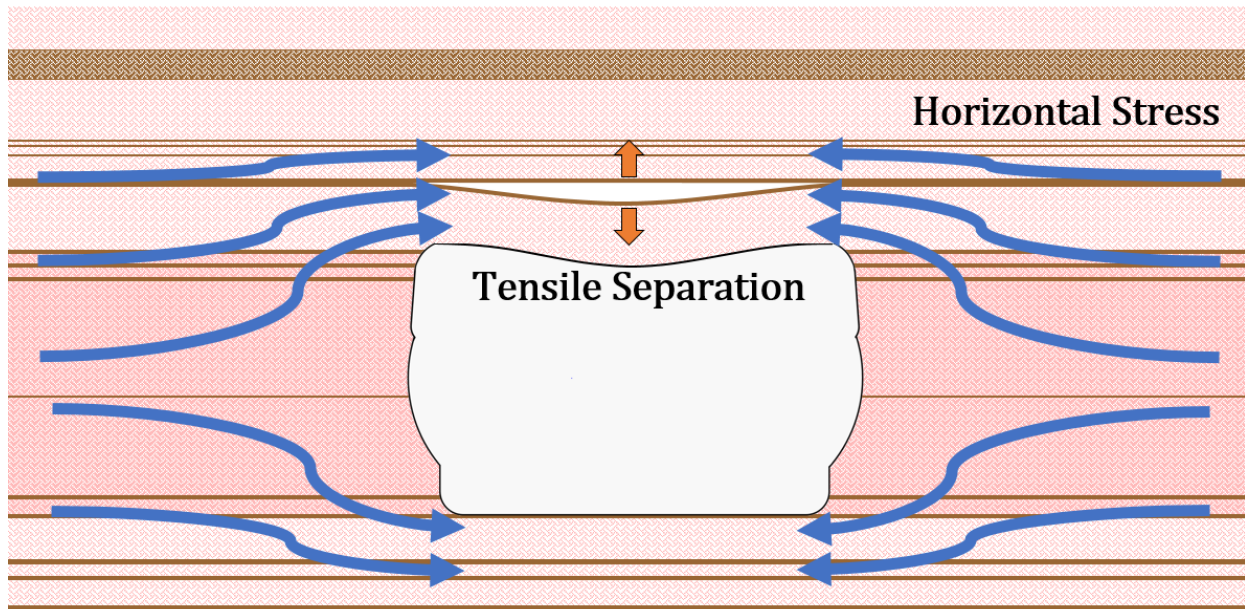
Typical tensile separation of back beam due to high horizontal stresses
